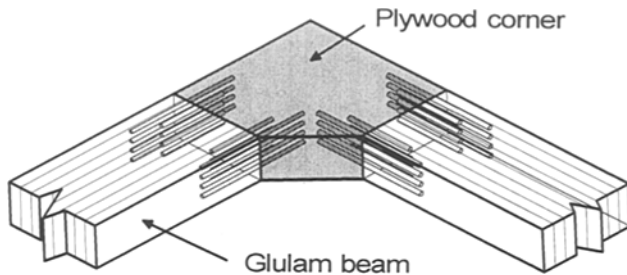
Plywood frame corner joining glulam beams by means of glued-in hardwood dowels
